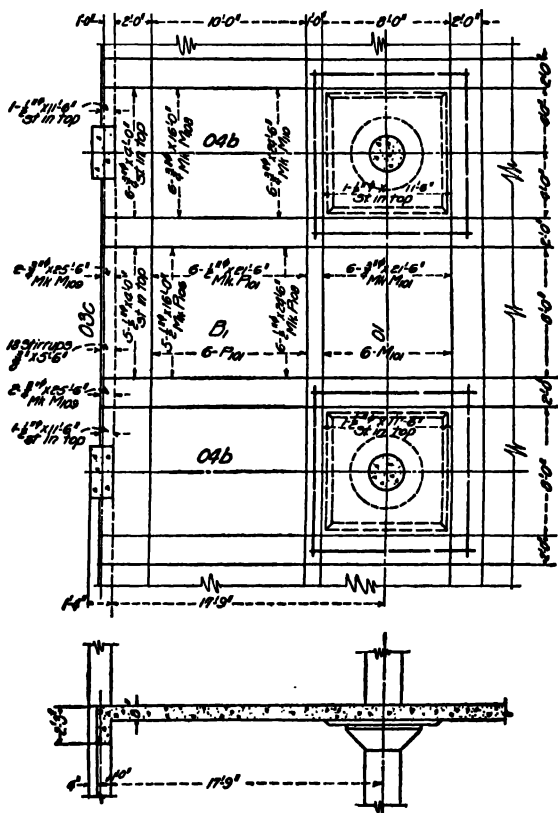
Exterior panel with deep spandrel girder, no capitals or brackets on exterior columns.
